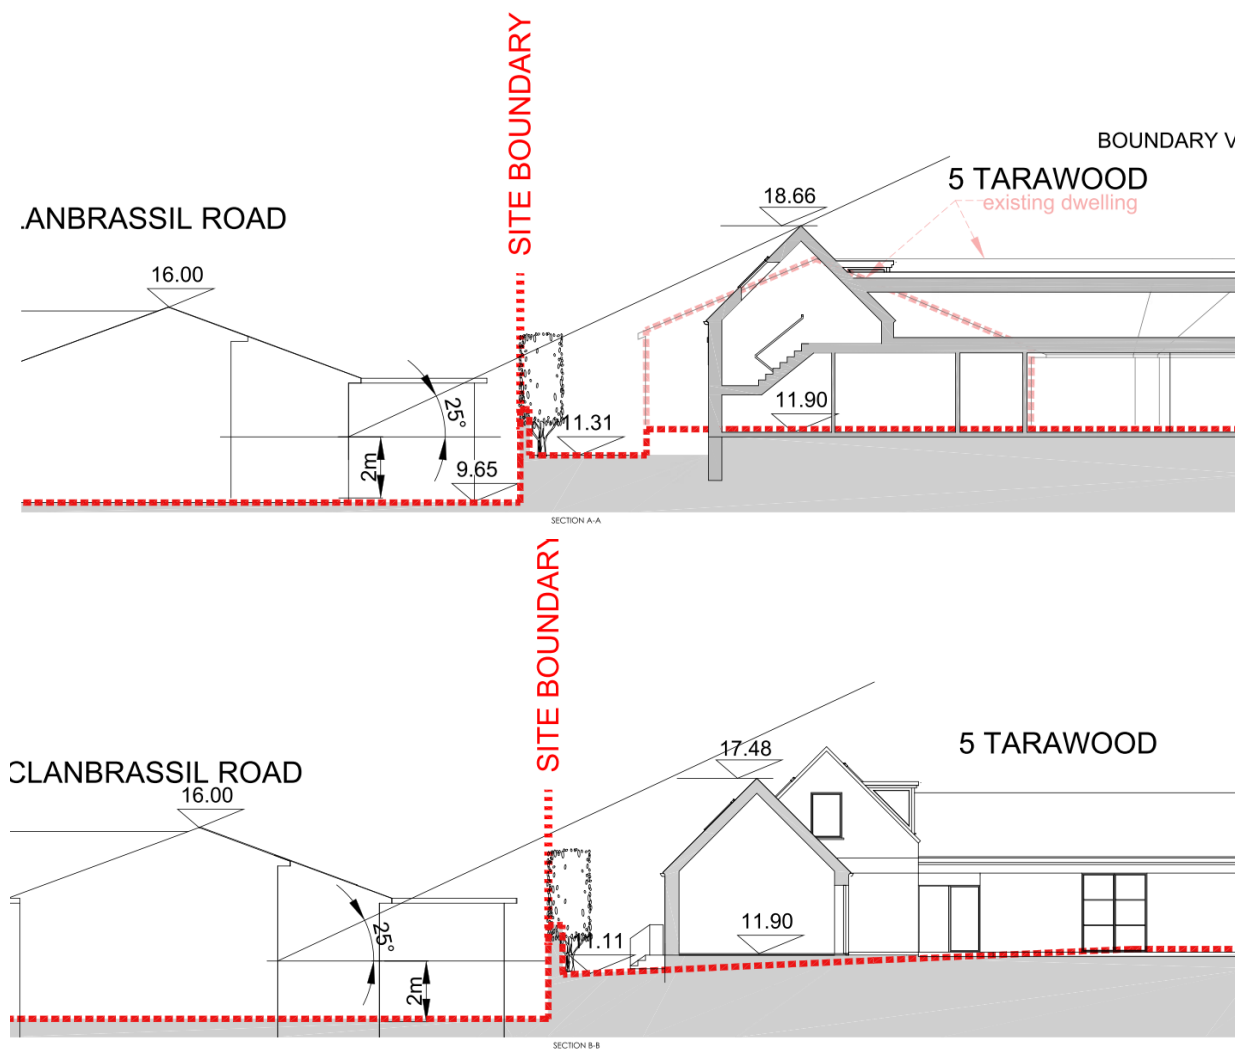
Sections showing existing and proposed dwelling outline and neighbouring building, 13 Clanbrassil Road.
